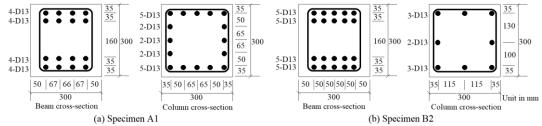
Reinforcement and details of beams and columns for the interior joint A1 and the exterior joint B2 tested by Yu
